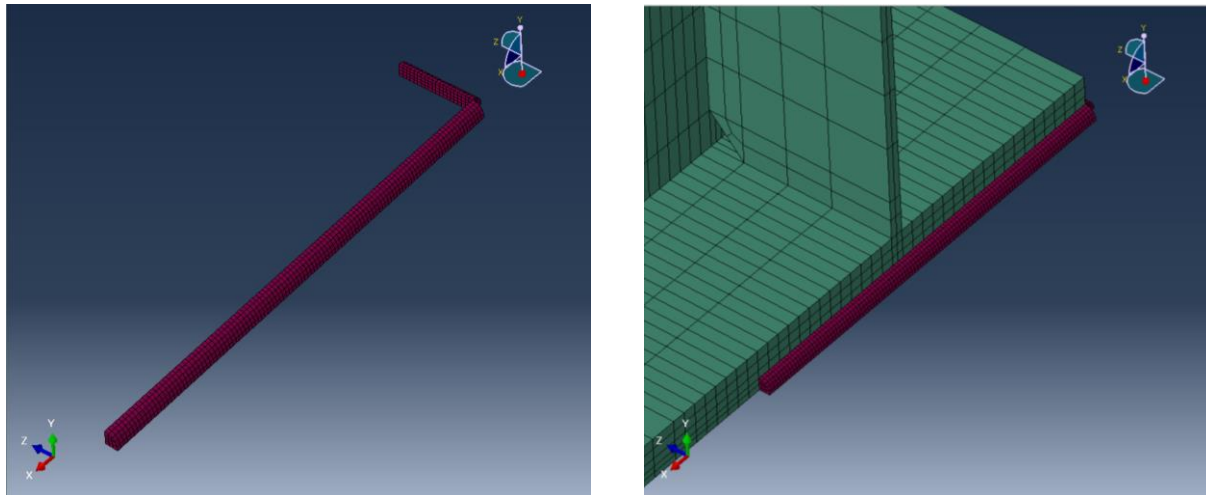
Weld (left), Weld and Girder (right)
